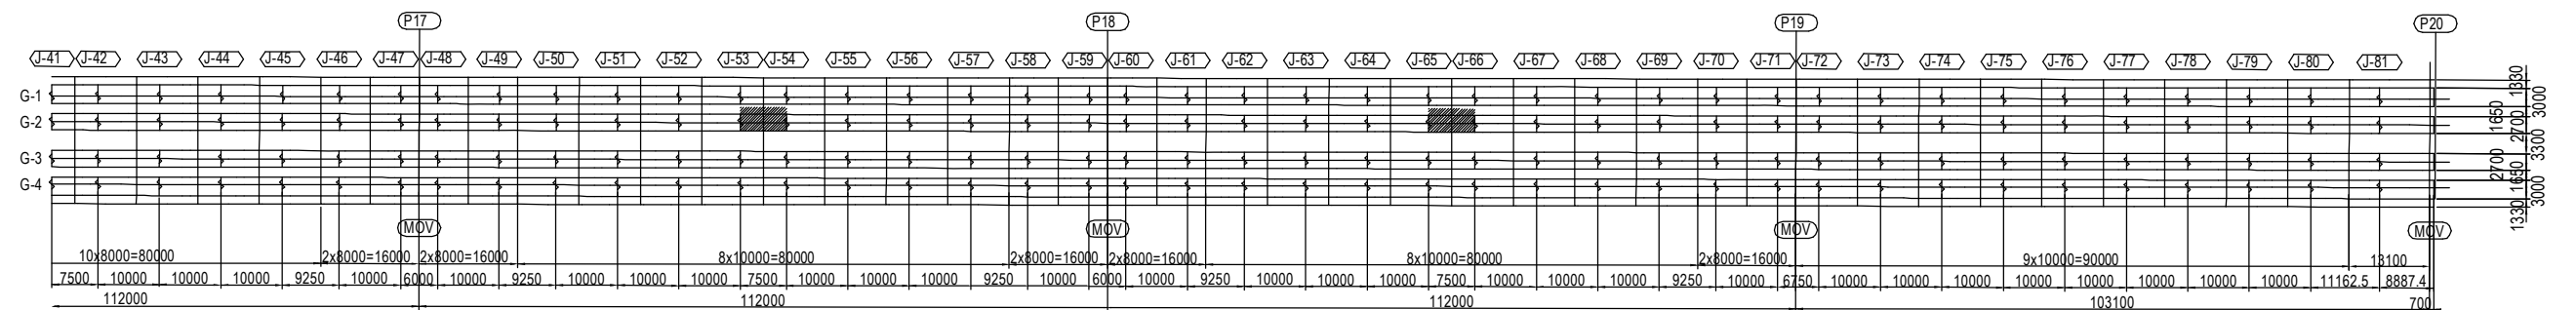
DETAIL OF DECK PLATE (43) S=1:60 (2-54,2-66)
